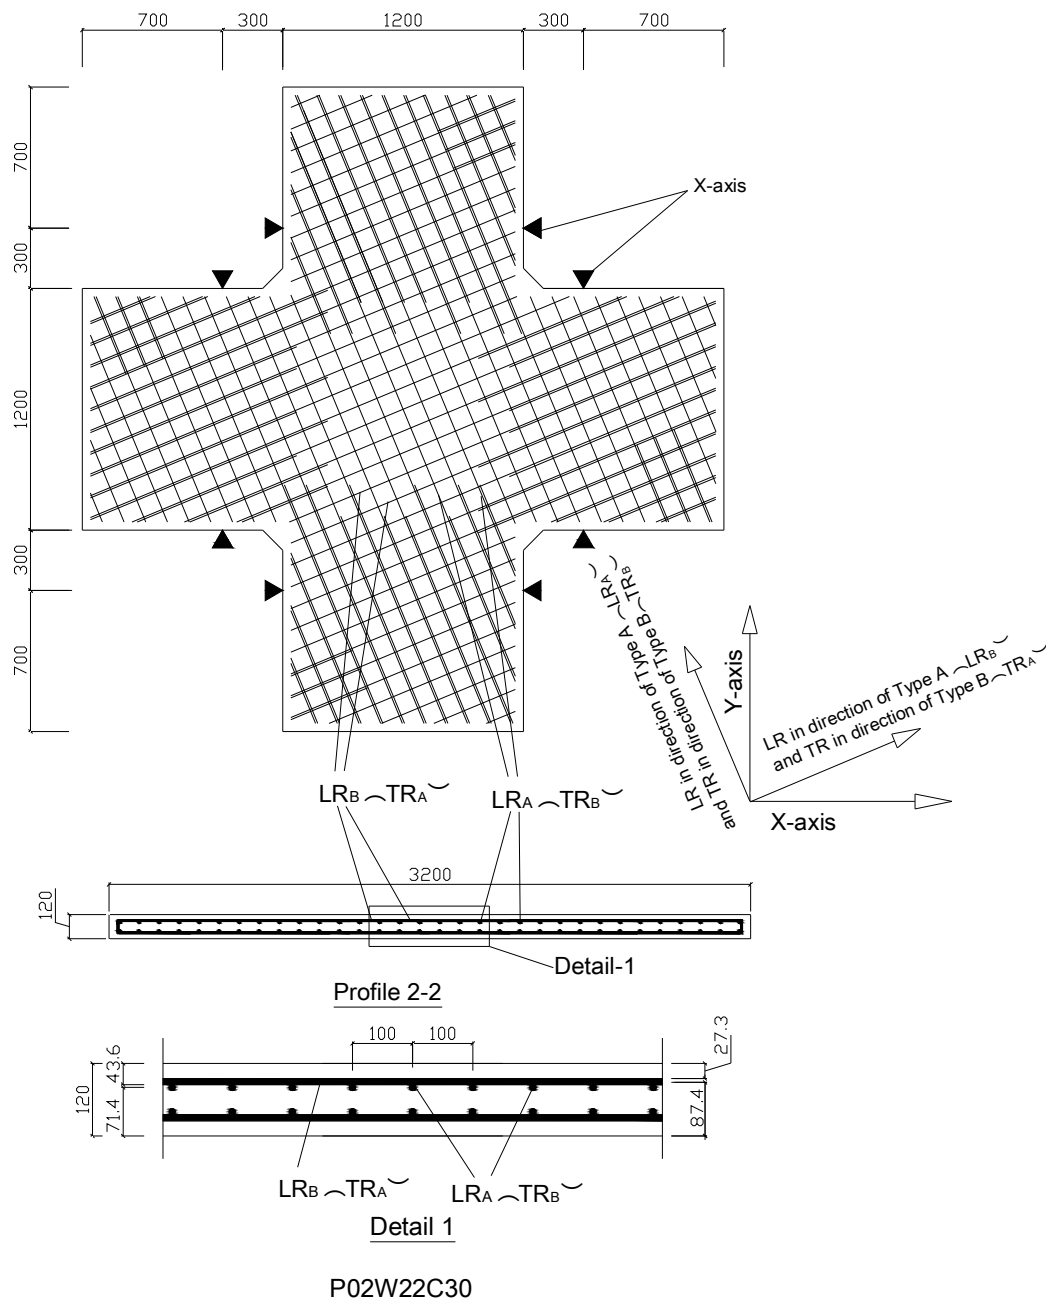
The reinforcement layout of test specimen P02W22C30 of Example 7.2.2
